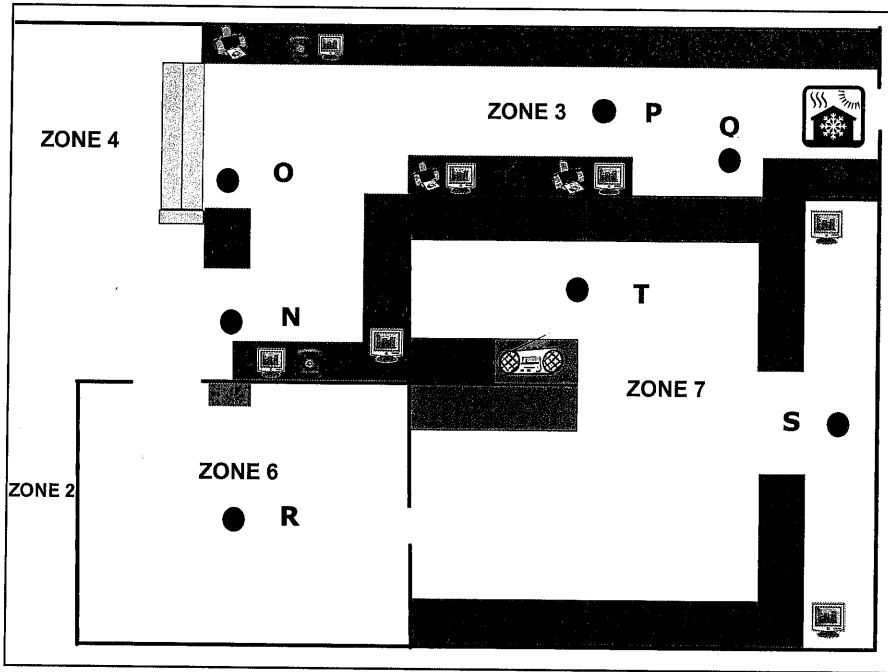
Floor plan zones 3, 6 and 7. Sampling sites (●).
